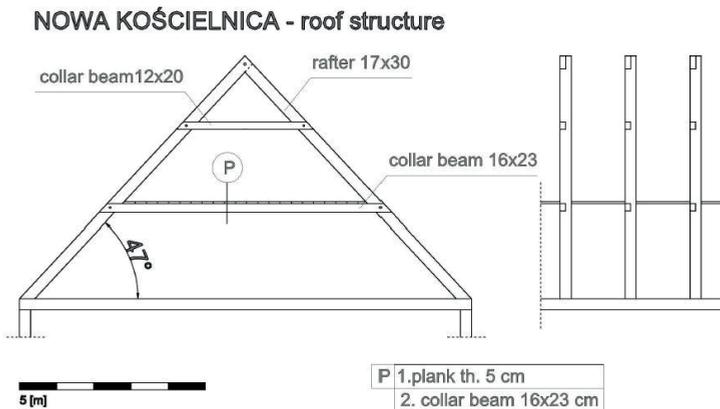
The simplified scheme of the roof structure of the arcaded house in Nowa Kościelnica. (author's study)
